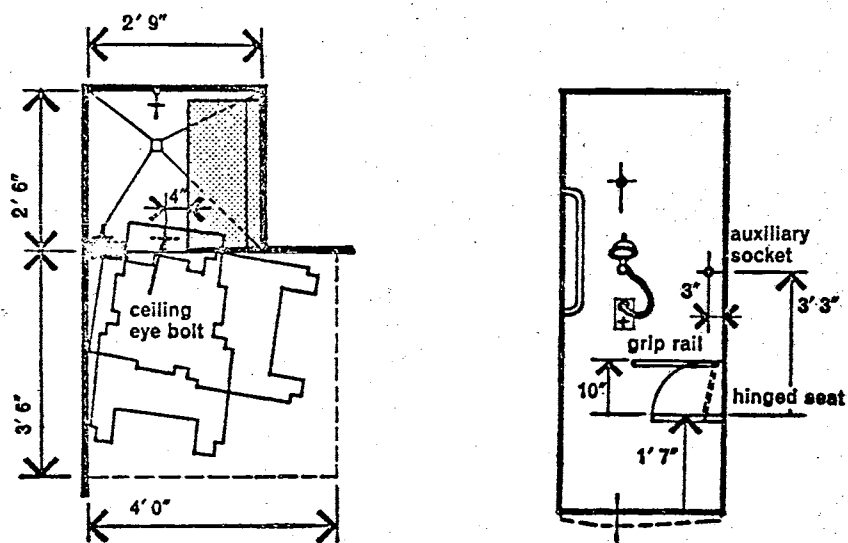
Plan for Small Shower Suitable for Wheelchair Users
